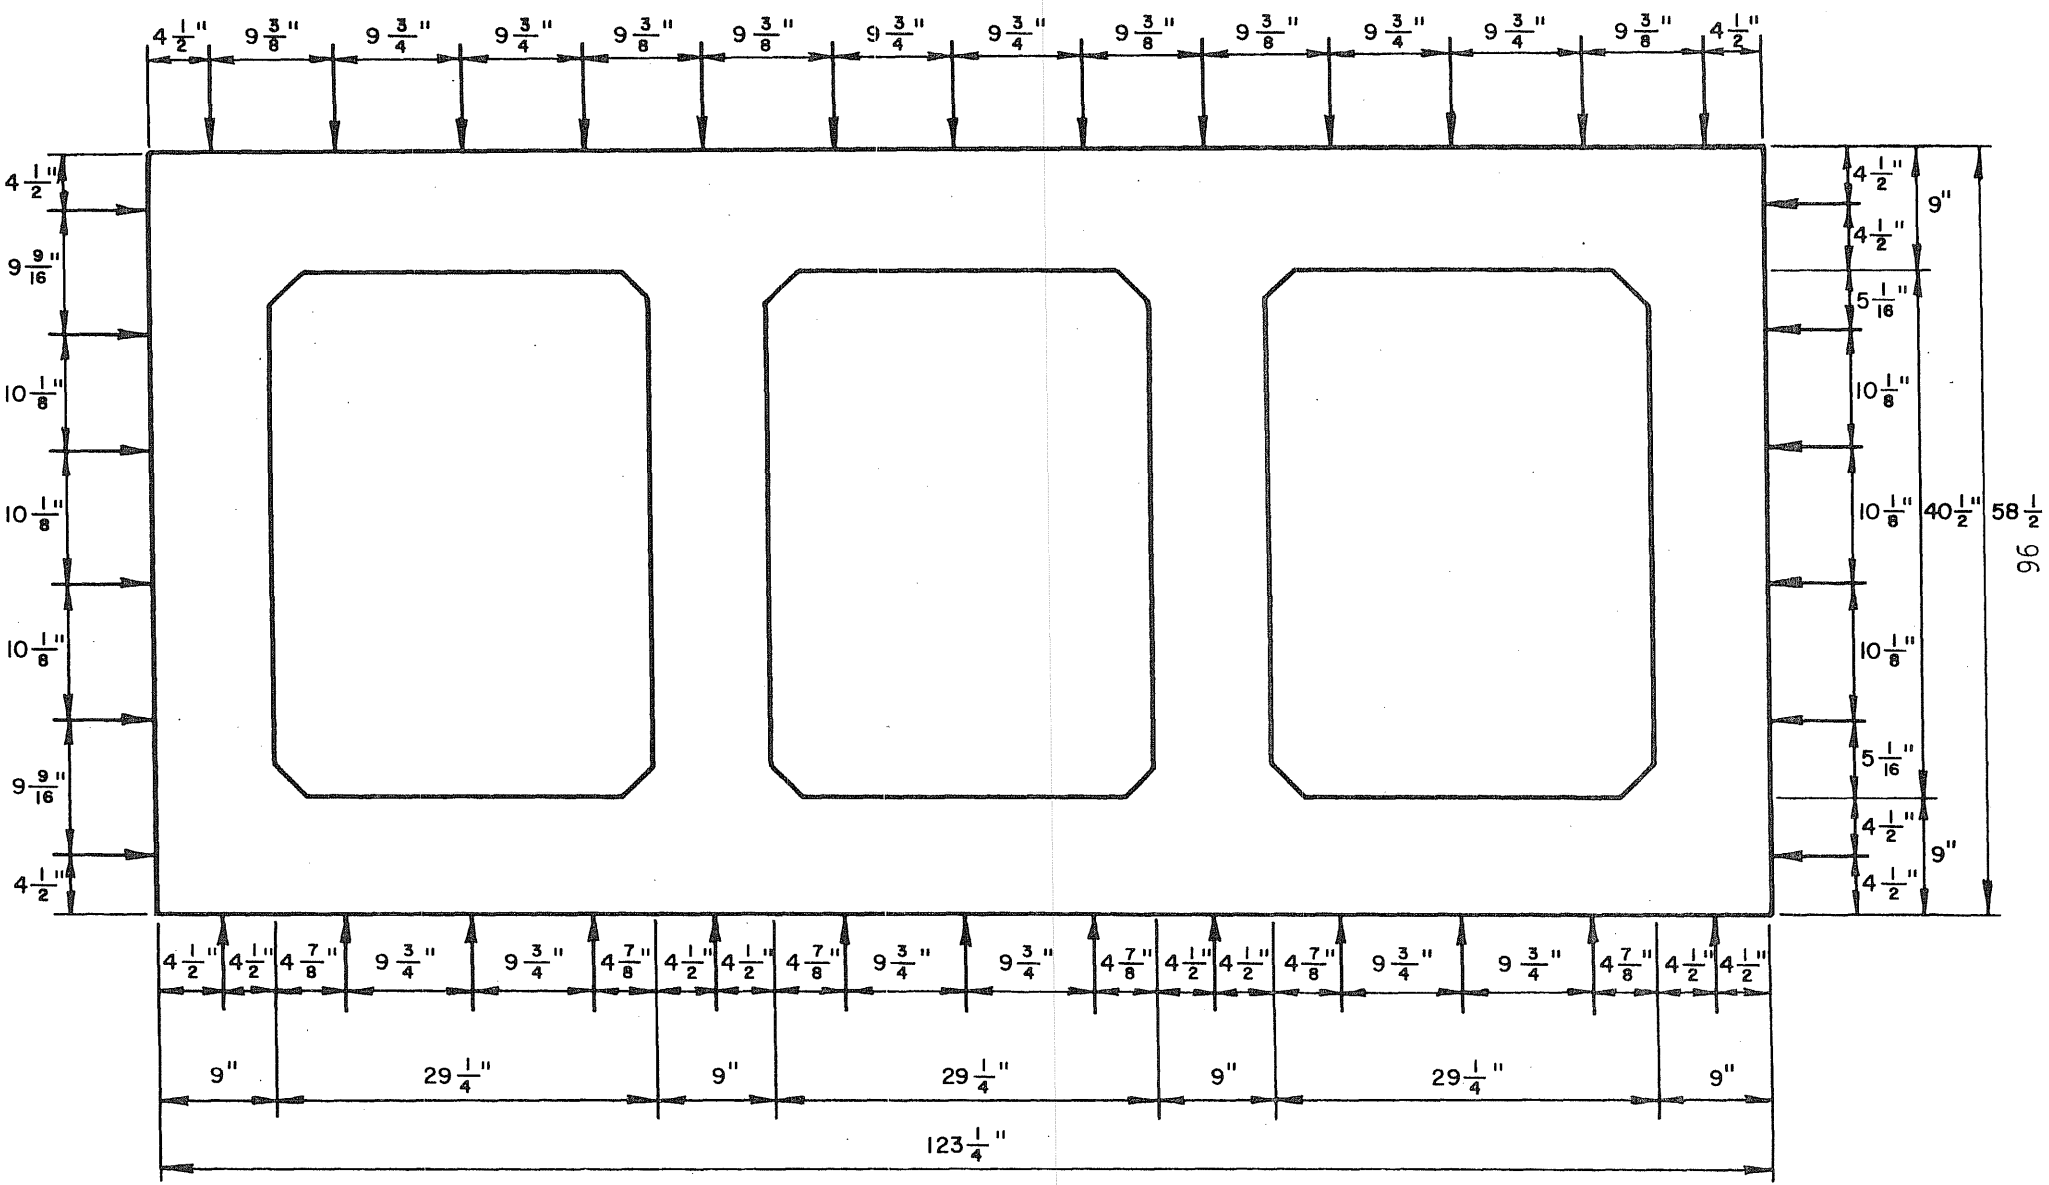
LOCATIONS OF LOADING UNITS FOR SPECIMENS R2 and R3
